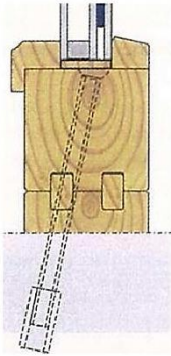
Section glazing beads and cable ducting on timber frame (Planning and installing, 2008).
